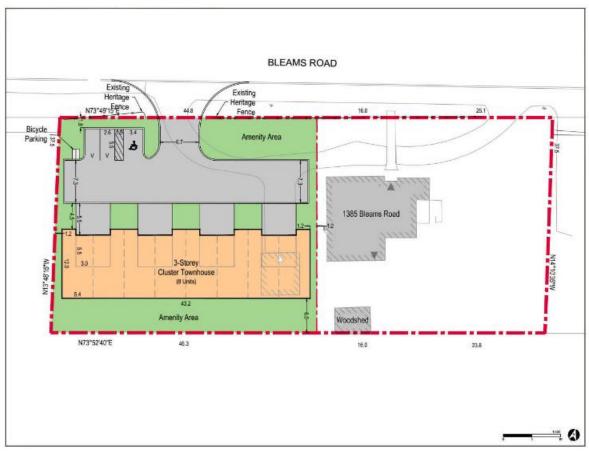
Proposed Concept Plan for the development. Source: Draft HIA
